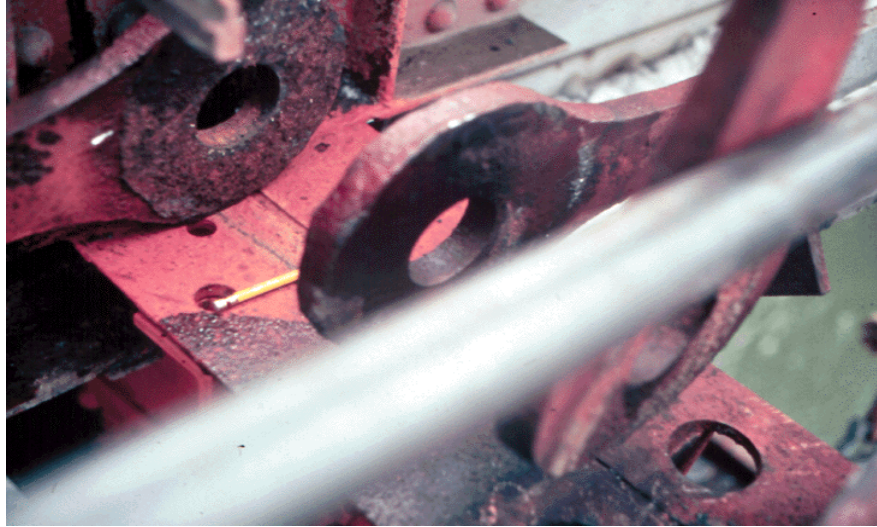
Eyebar Pin Hole (Disassembled Connection)
